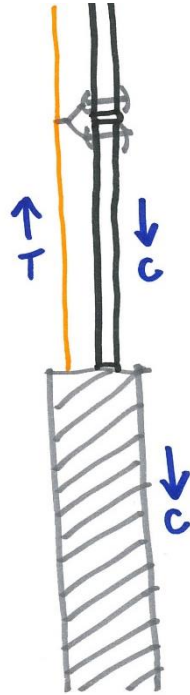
Concept Sketch - load-bearing opaque wall and cable net glazing
